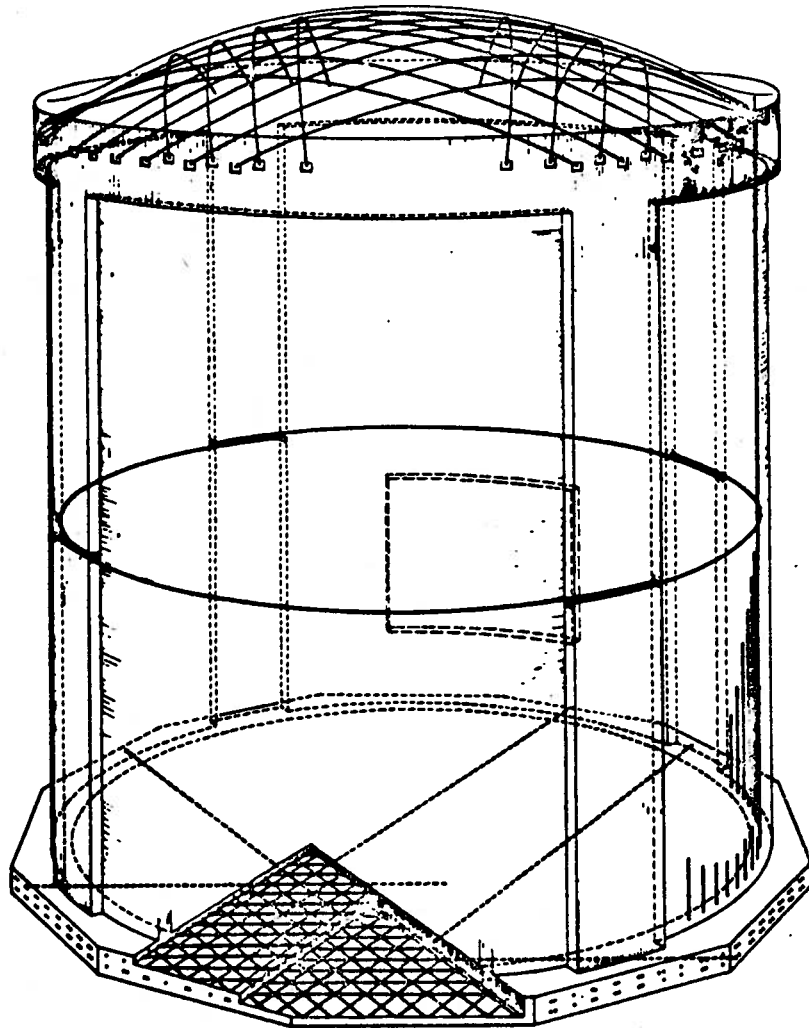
Reactor Building Prestressing Cable Arrangement
